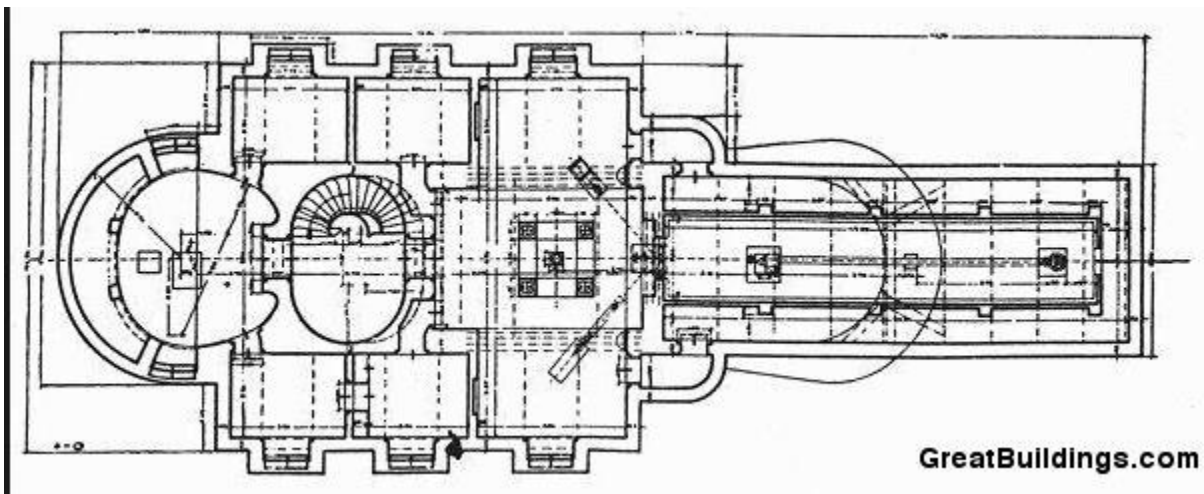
Einstein tower Floor plan, Potsdam-Berlin, by Erich Mendelsohn, 1919-22
